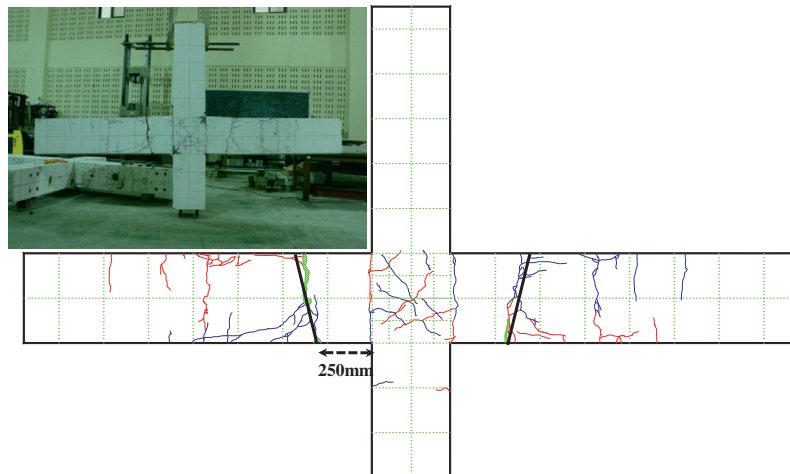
Crack Patterns at Failure of PC-I-25 Specimen.
